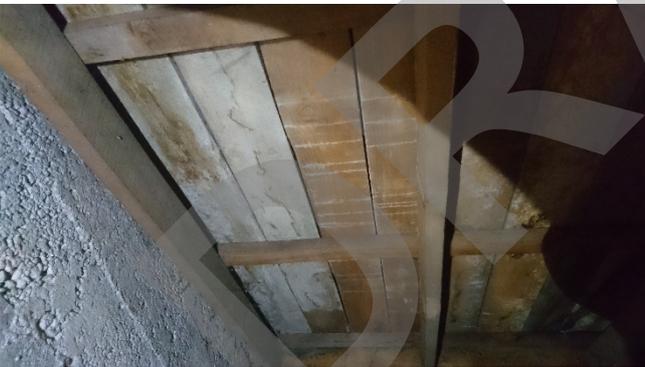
View of timber board roof; the concrete 'wall' to the left is part of the war memorial at the entrance
